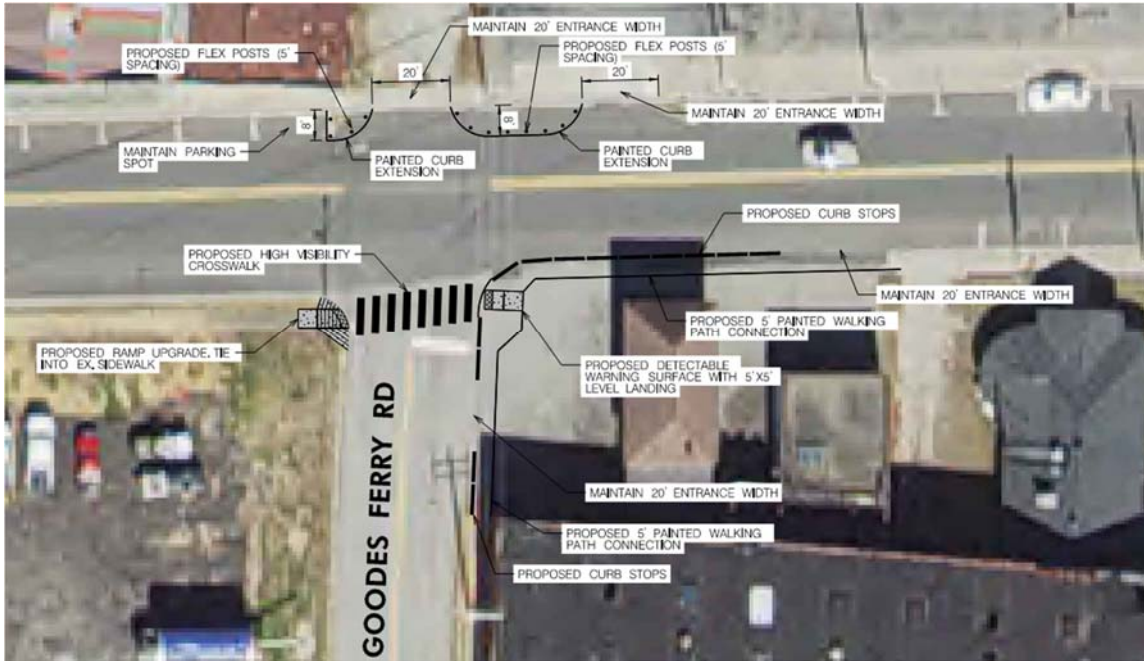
Goodes Ferry/Car Wash at W. Danville - Conceptual Recommendation - Short Term
